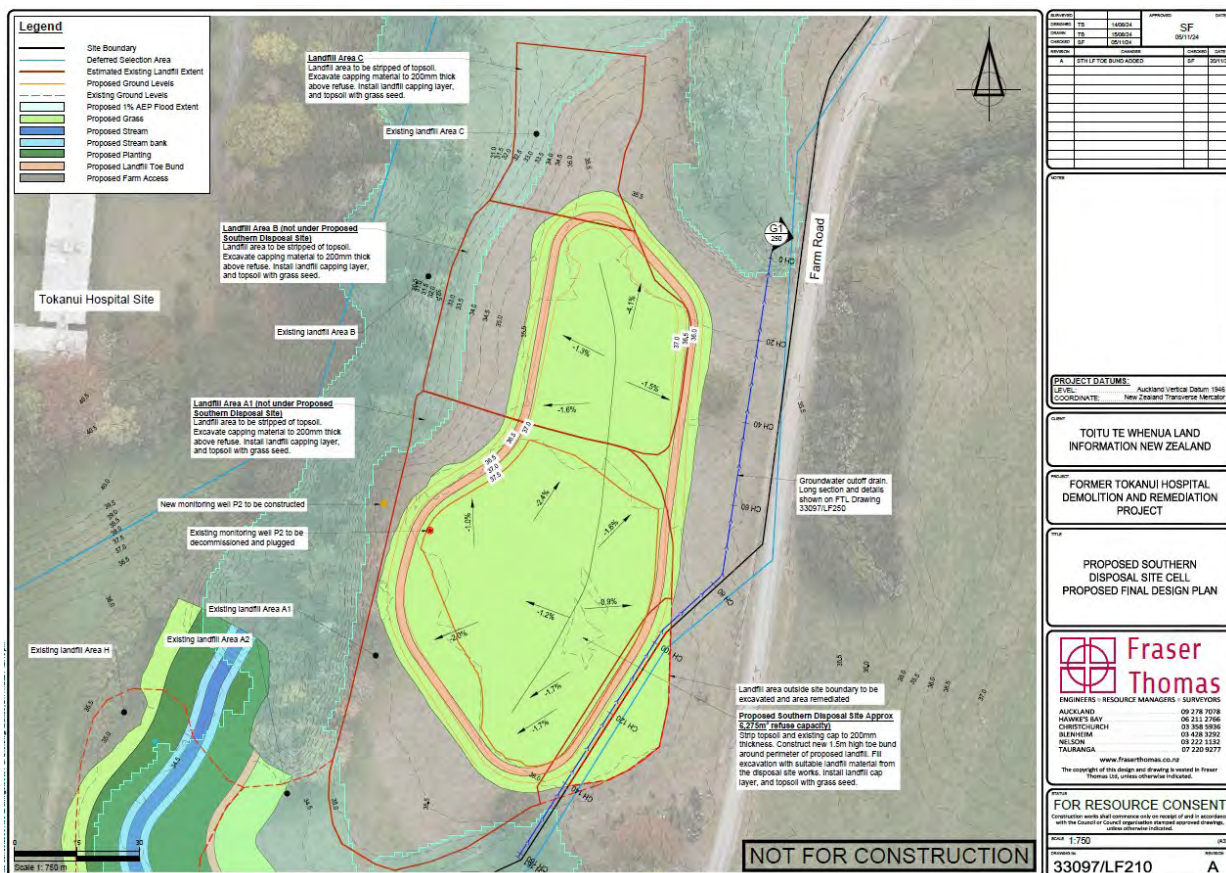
Proposed Southern Disposal Site Cell – Proposed Final Design Plan
